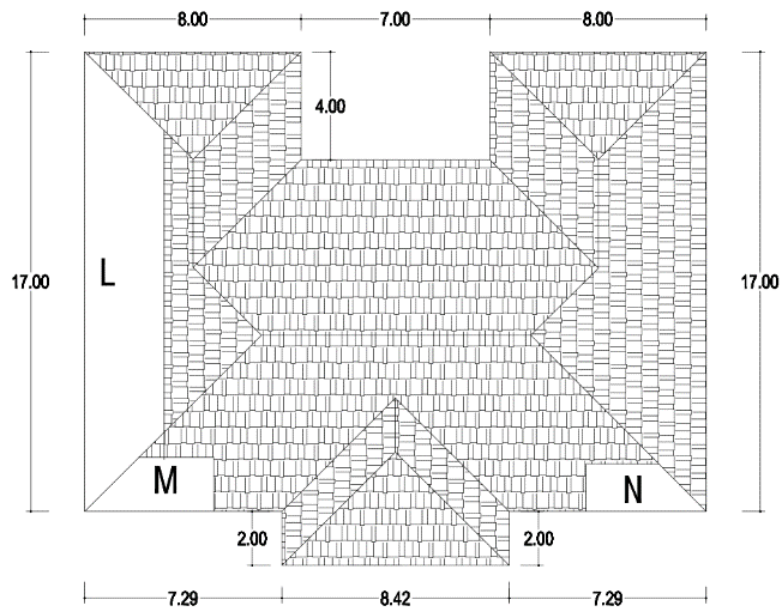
Sketch of the damaged roof plan with codes L,M and N
